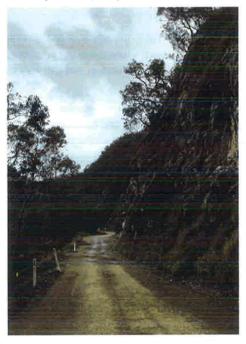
Narrow road with unsecured landslip pose risks for road users
